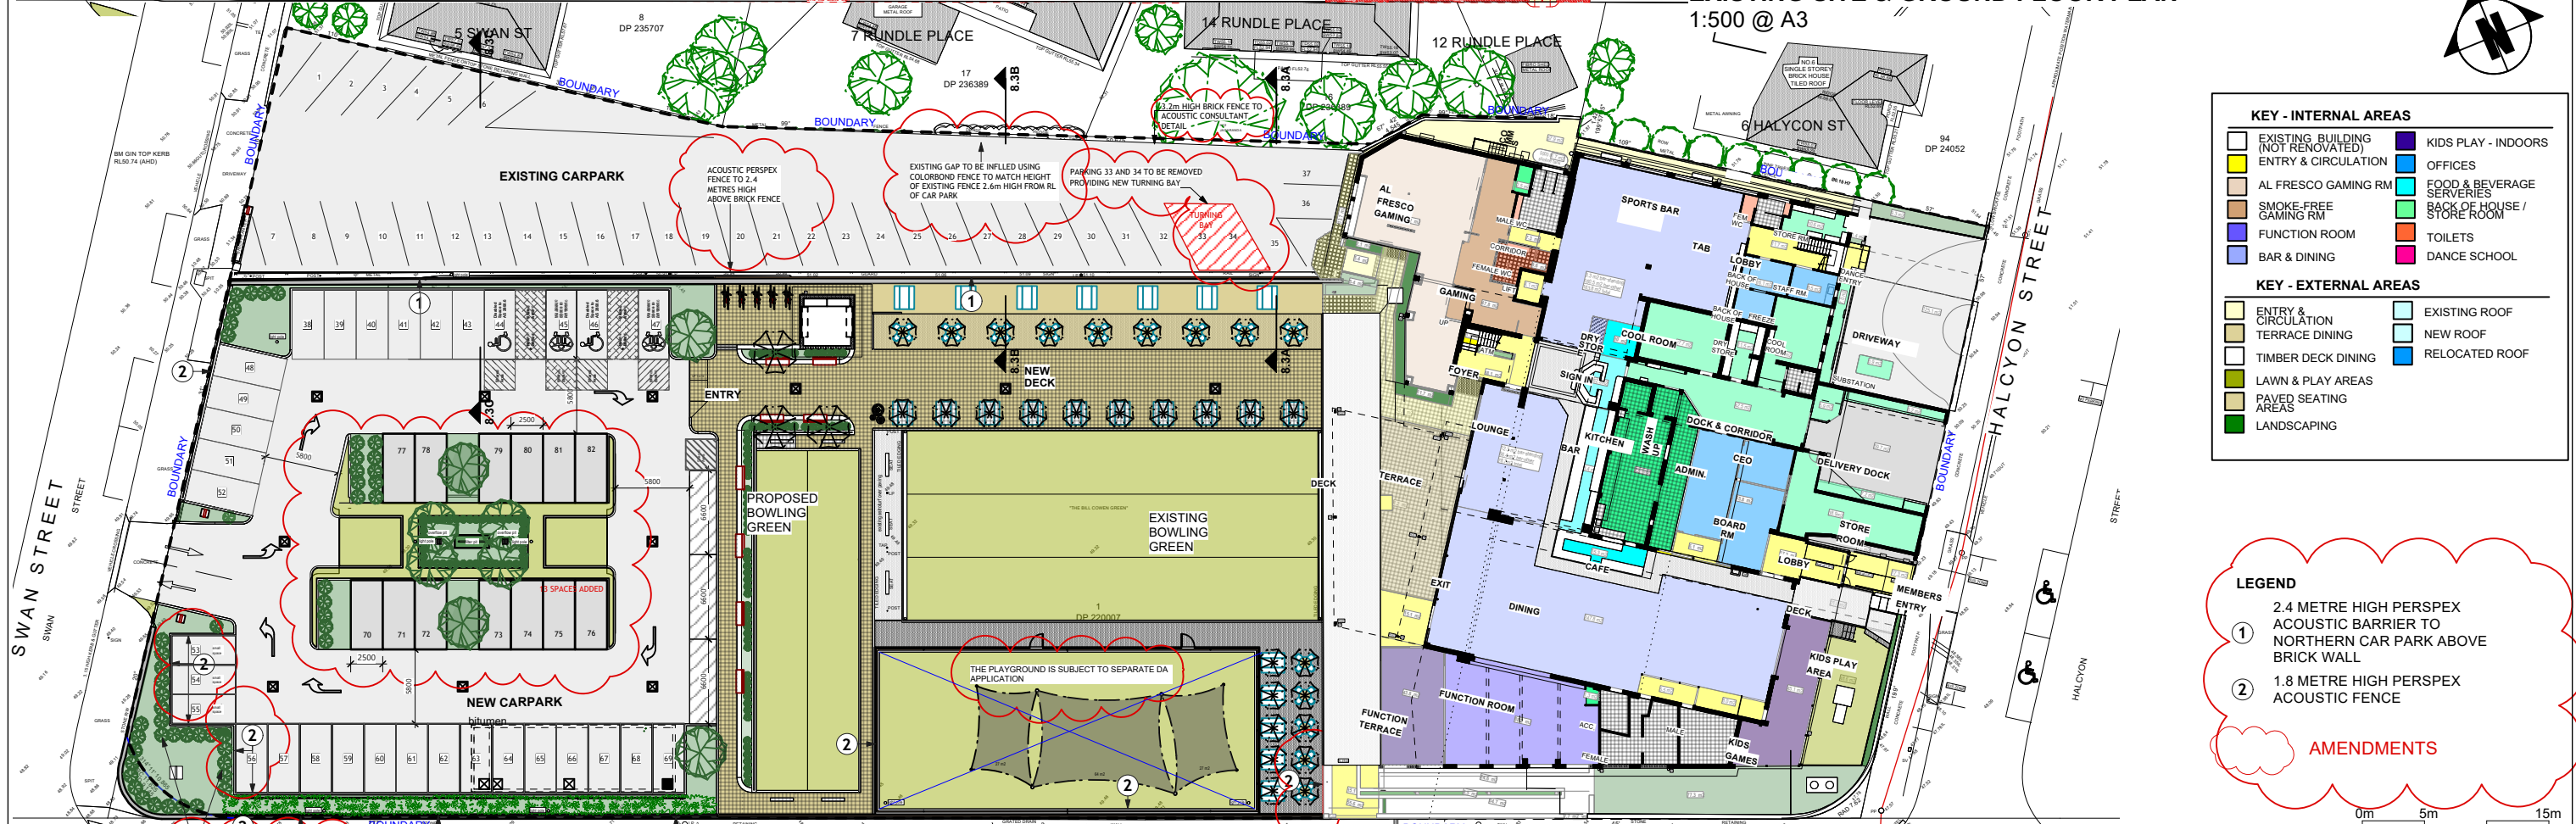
B - AMENDED CAR PARKING LAYOUT
